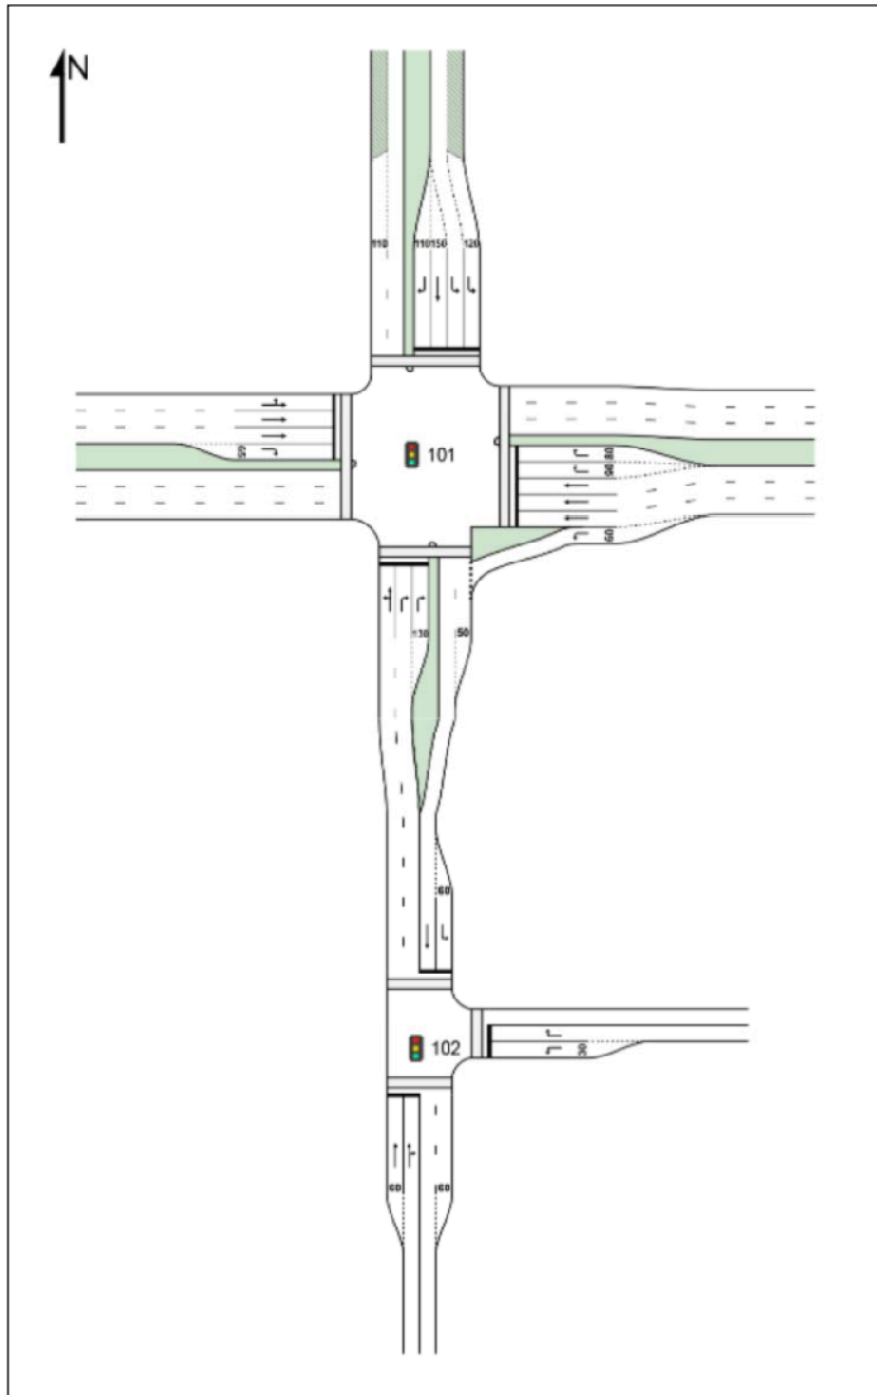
Proposed Link Road and Newbridge Road connections at Brickmakers Drive
